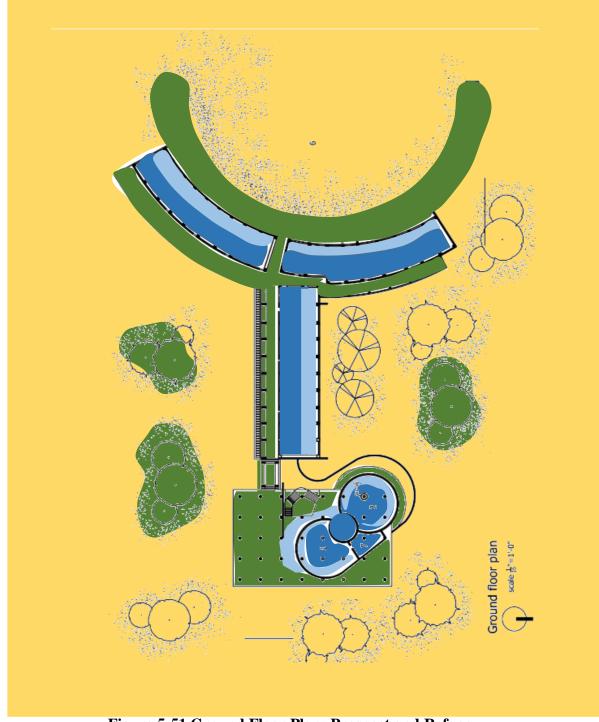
Ground Floor Plan: Prospect and Refuge
